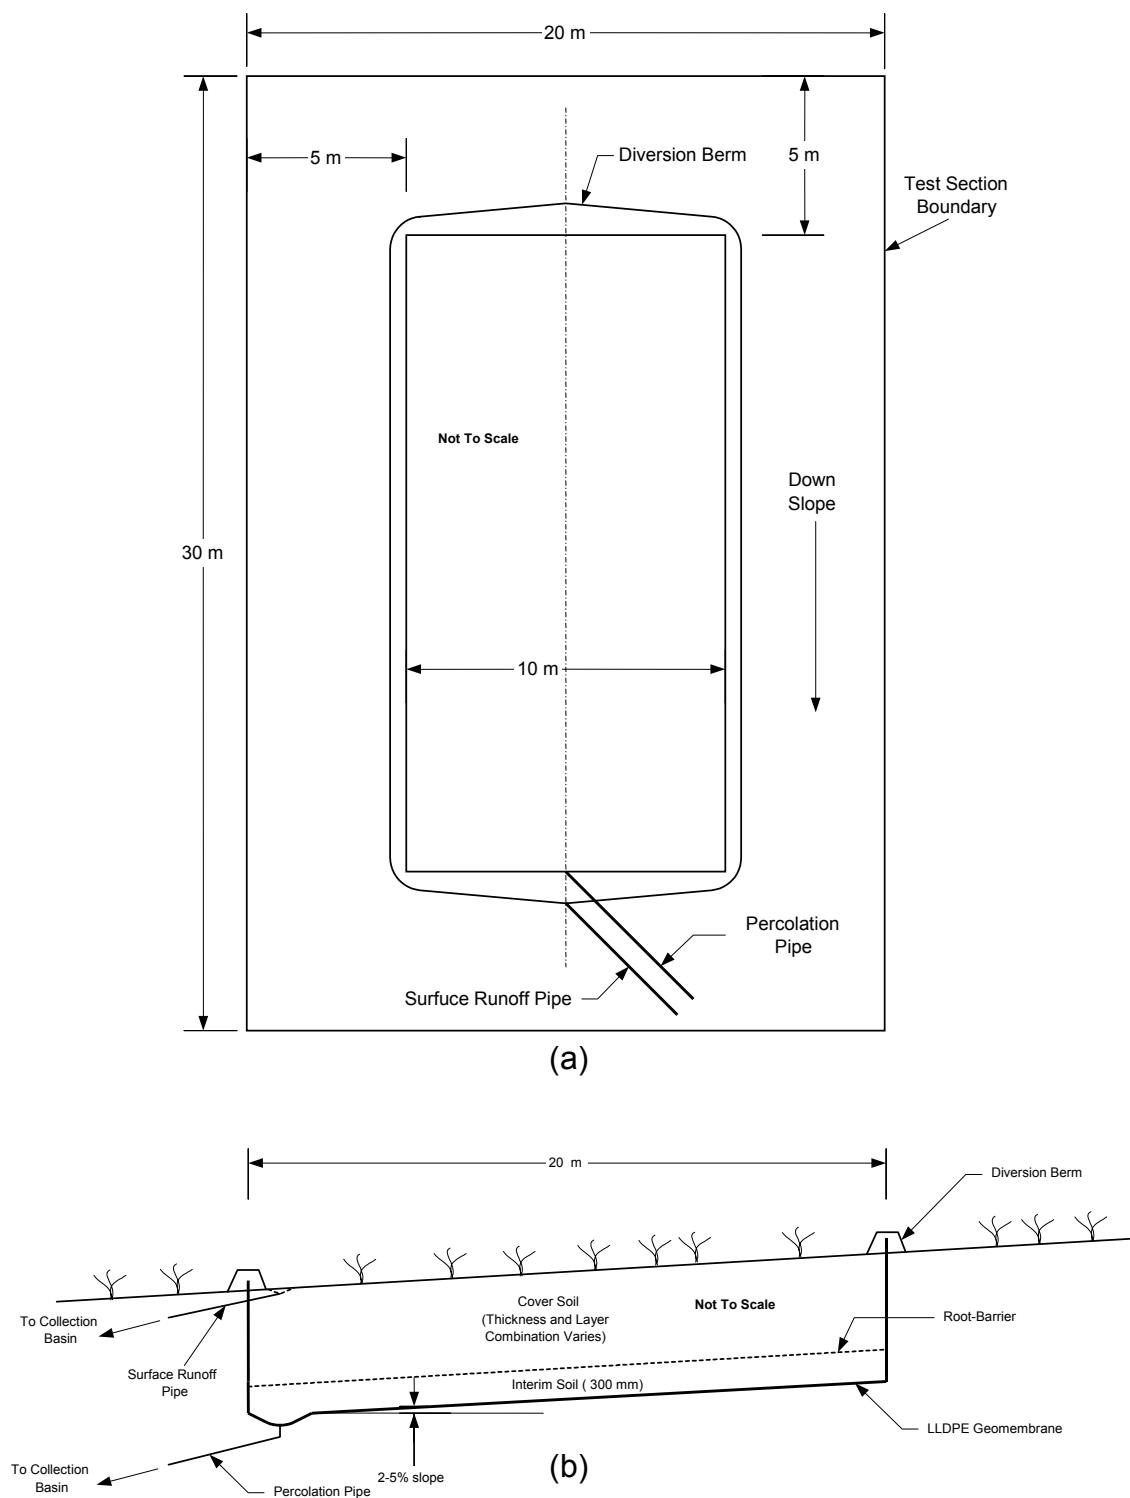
Schematic of ACAP Test Section and Lysimeter: (a) Plan View and (b) Cross-Section.
